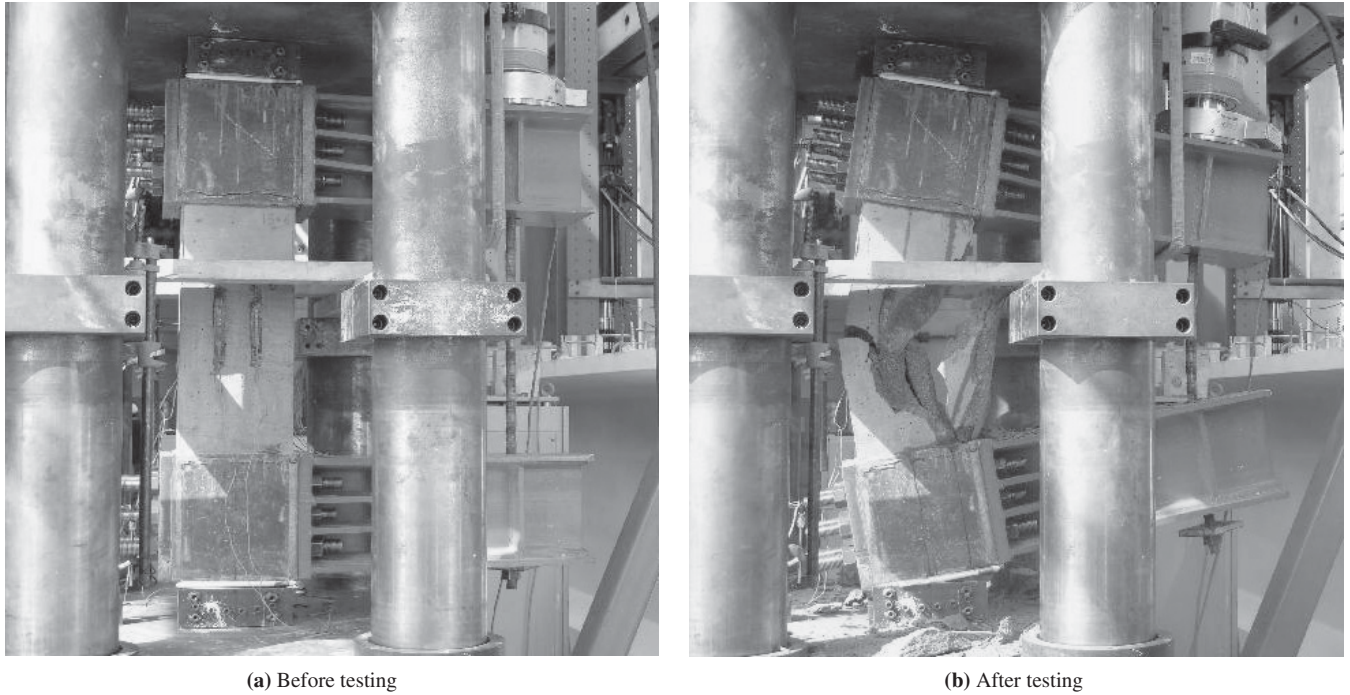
Typical failure mode for eccentric bracket specimens (18EB6).
